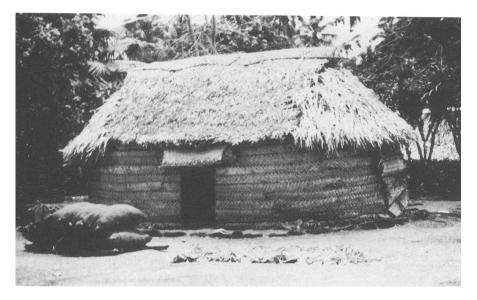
Thatched roof from *au* (sugar cane leaves) on a Tonga house
